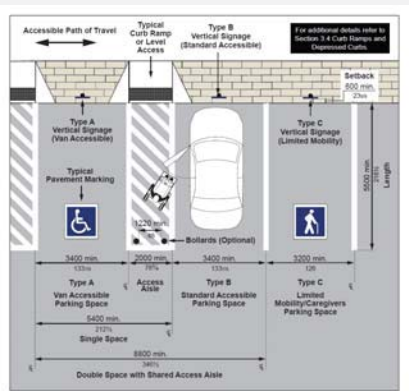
Perpendicular Accessible Parking Space Dimensions - Plan View
